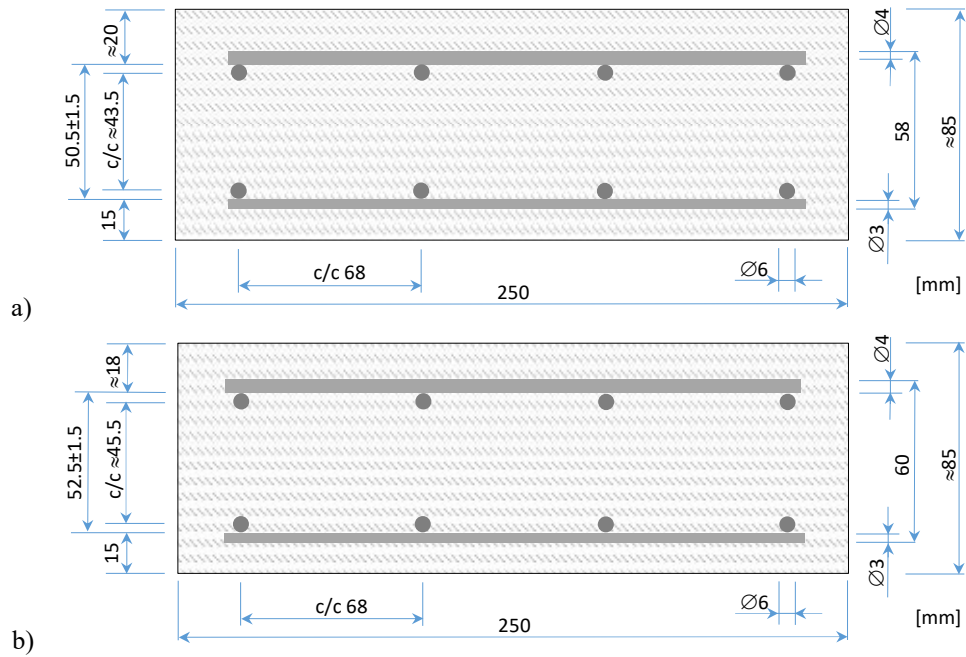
The reinforcement layouts of the wall elements, cross sections, with figure a) referring to wall elements B1-B11 and figure b) referring to wall elements S1-S5.
